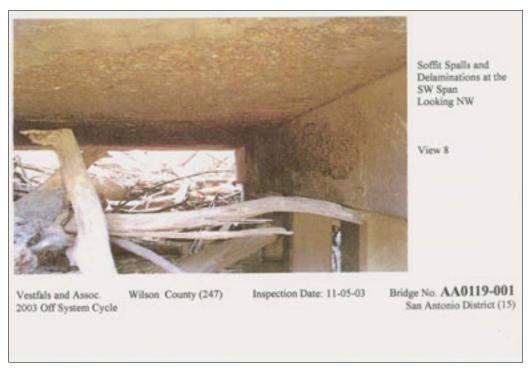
Photo shows soffit spalls and delaminating at the SW span looking NW on the Wilson County CR 117 Bridge.
